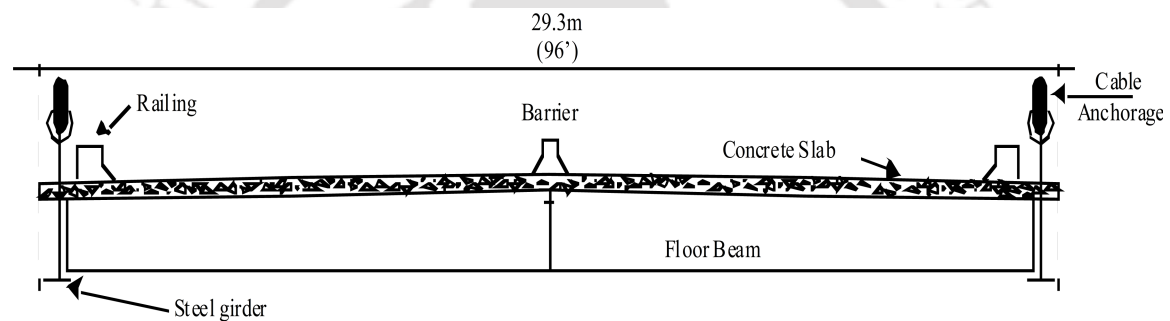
Cross section of the deck [Dyke *et. al.* (2003)]
